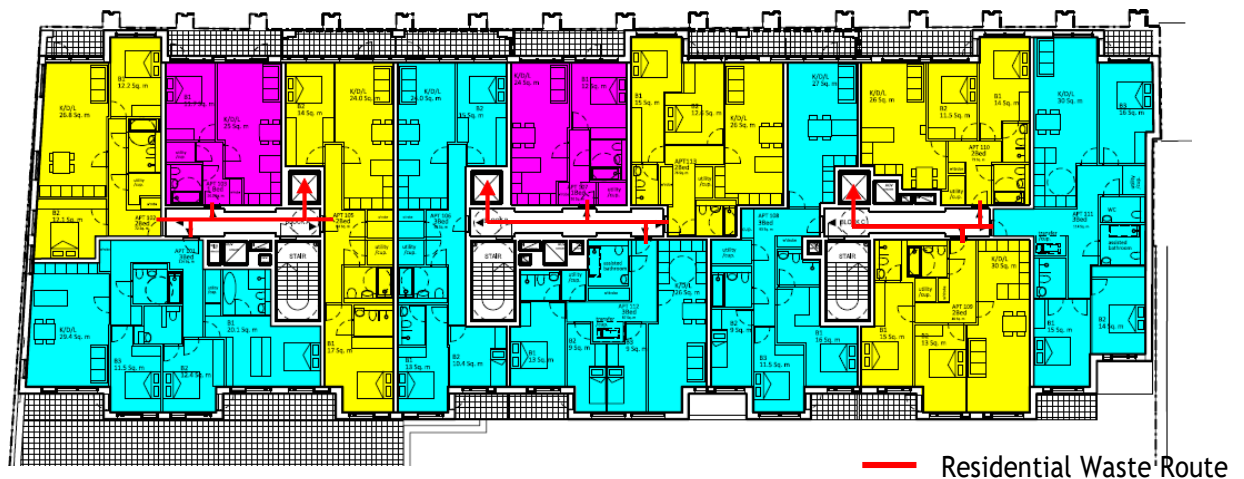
First Floor Residential Waste Route (The same route applies for floors 1-6)
